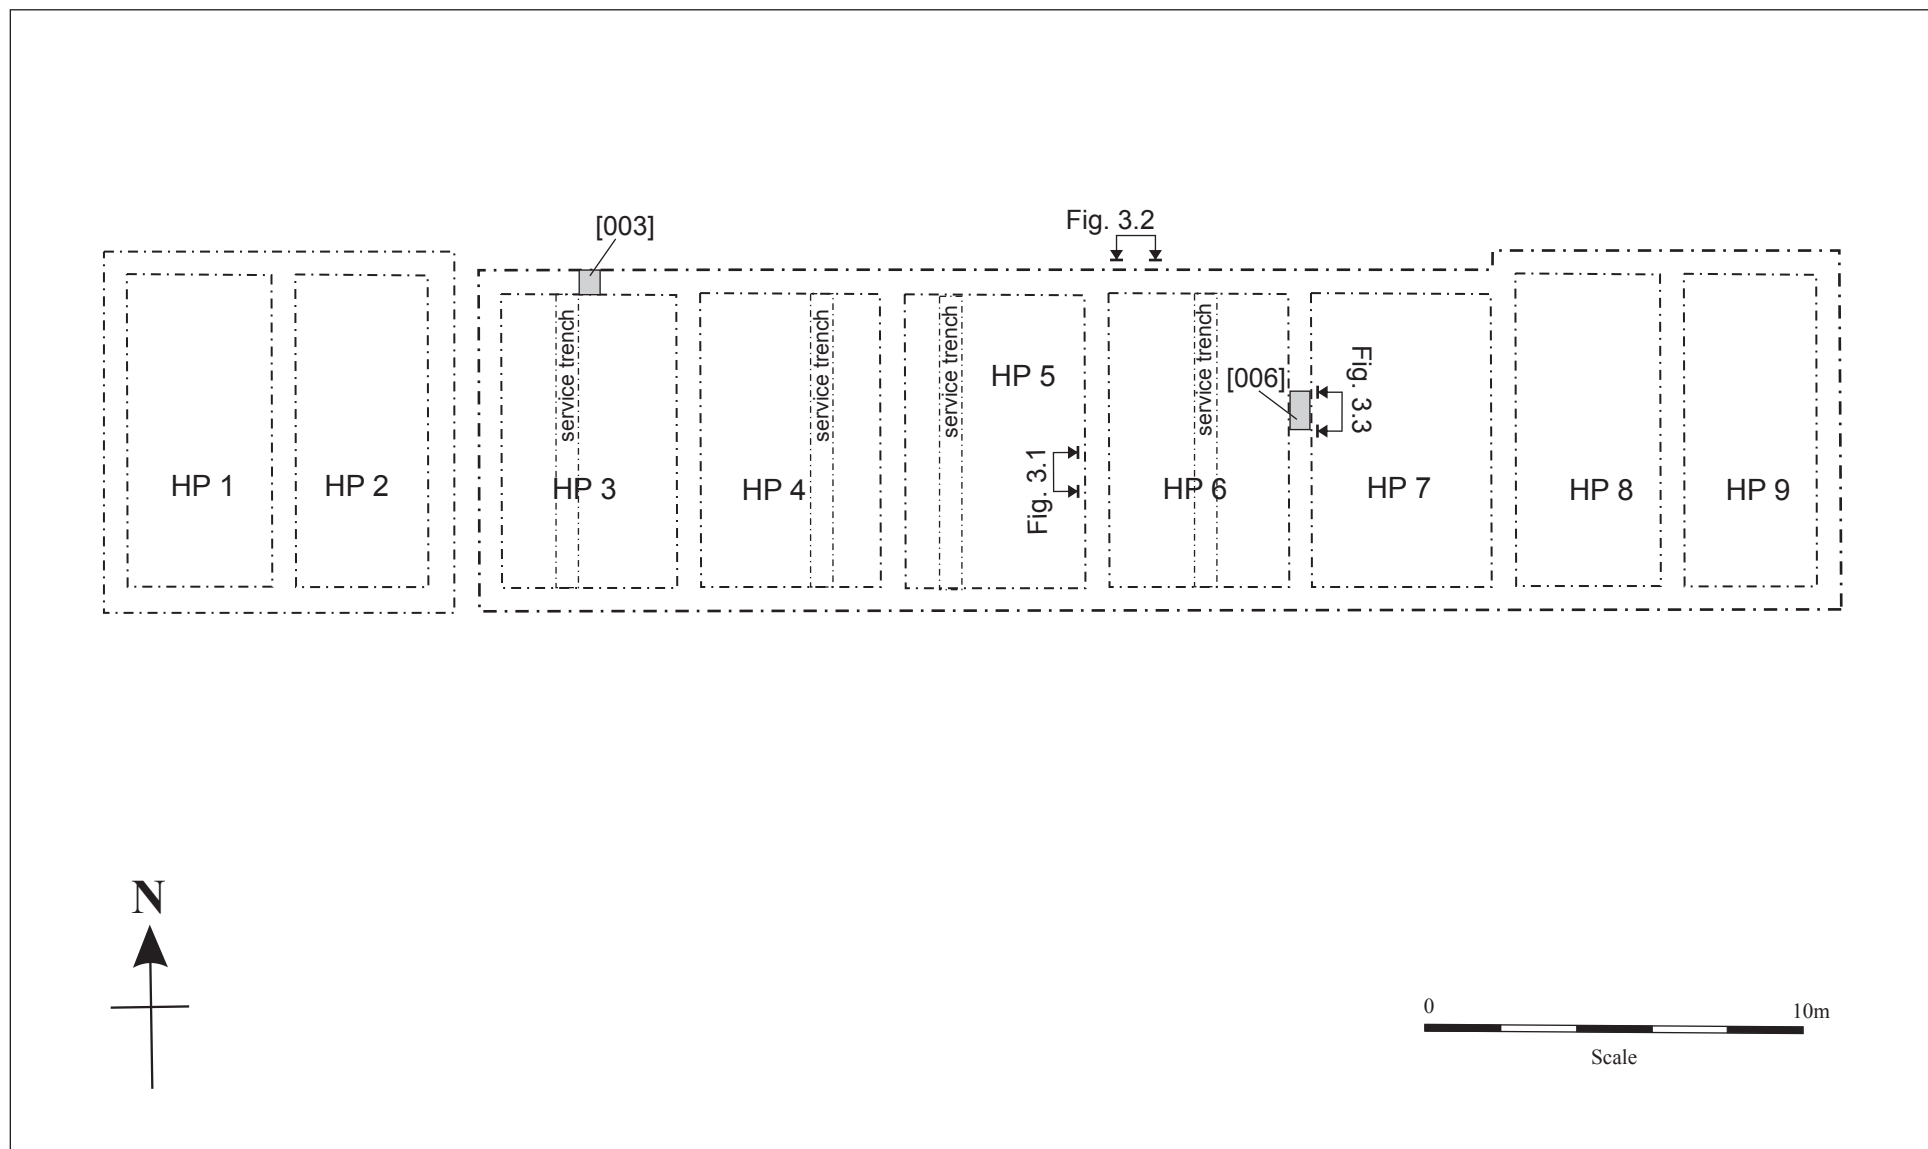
Detailed site plan showing locations of sample sections in Fig. 3.
